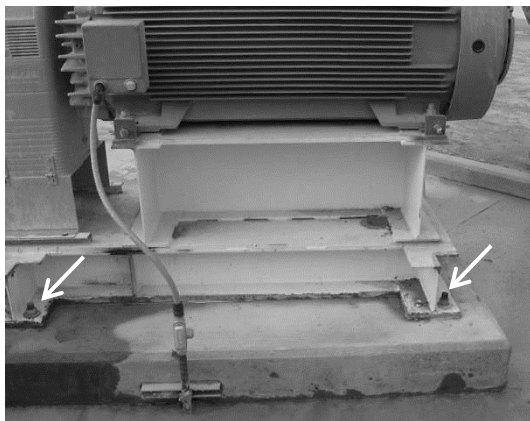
Flanges of the Skid Wide Flange Beams Were Used For Anchor Bolt Hold Down.
